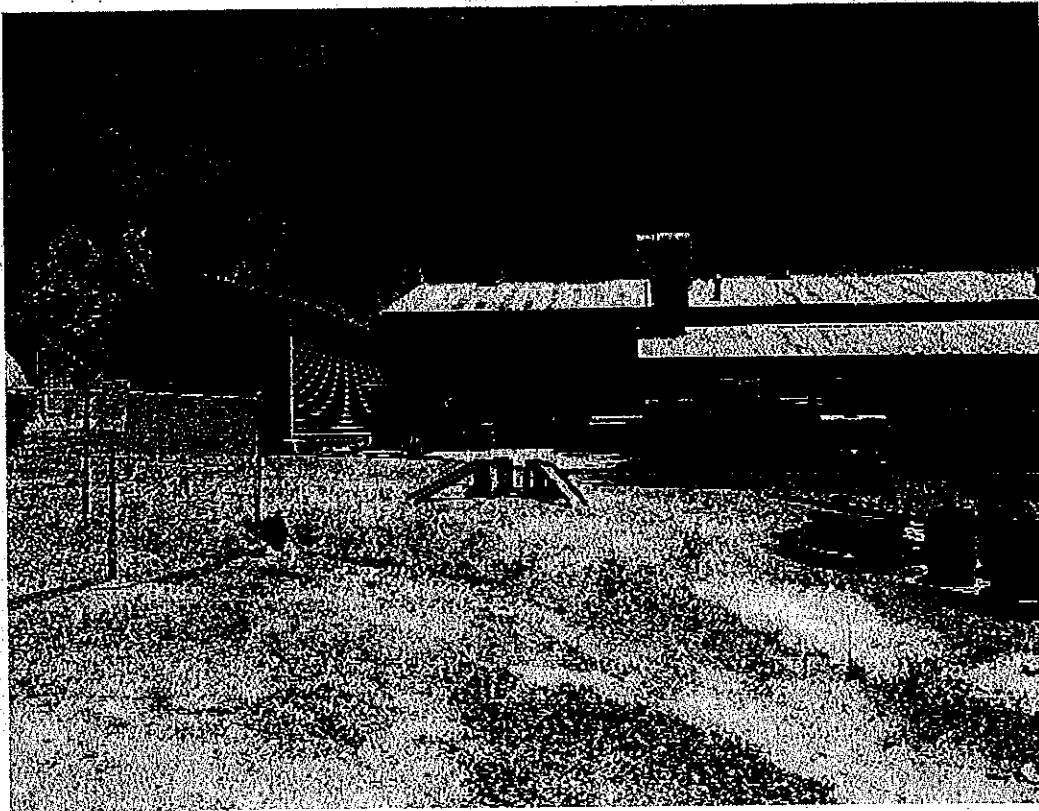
Looking East, trench run from project site to electrical panel on Mechanics Building.
